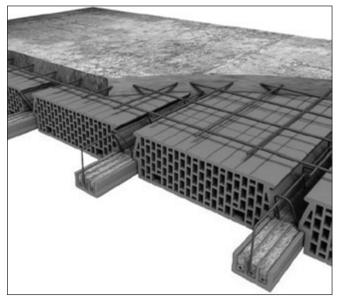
The Porotherm floor system consisting of prefabricated, prestressed concrete beams, clay blocks and an in situ reinforced concrete layer
